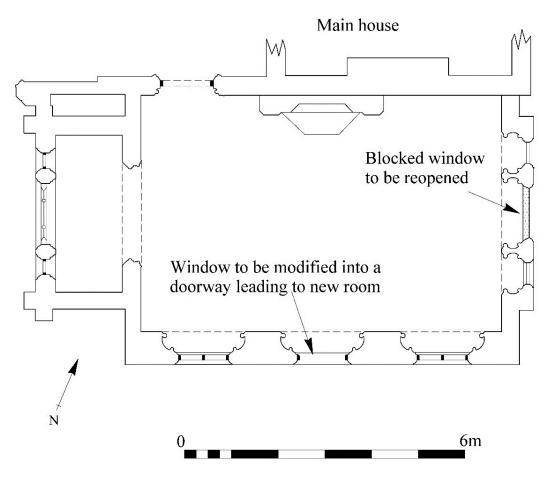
Plan of morning room as existing Modified from plan supplied by client
